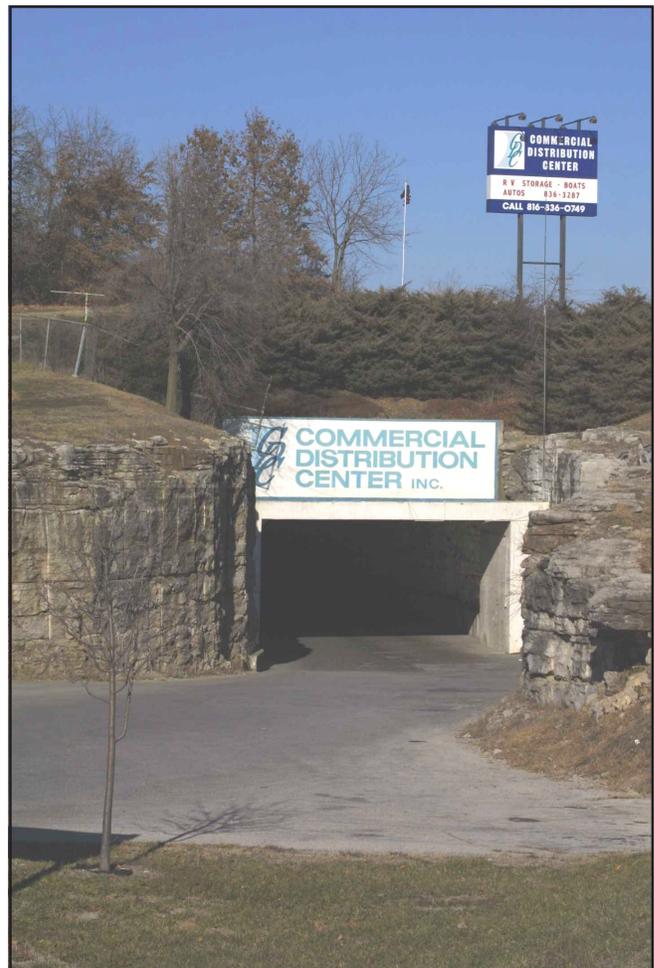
Entrance to Commercial Distribution Center, an underground warehouse facility developed in the Bethany Falls limestone. Note that the upper 1-2 meters of rock have been left in-place above the tunnel ceiling, to form the mine roof. (Image by Ken Stalder)
